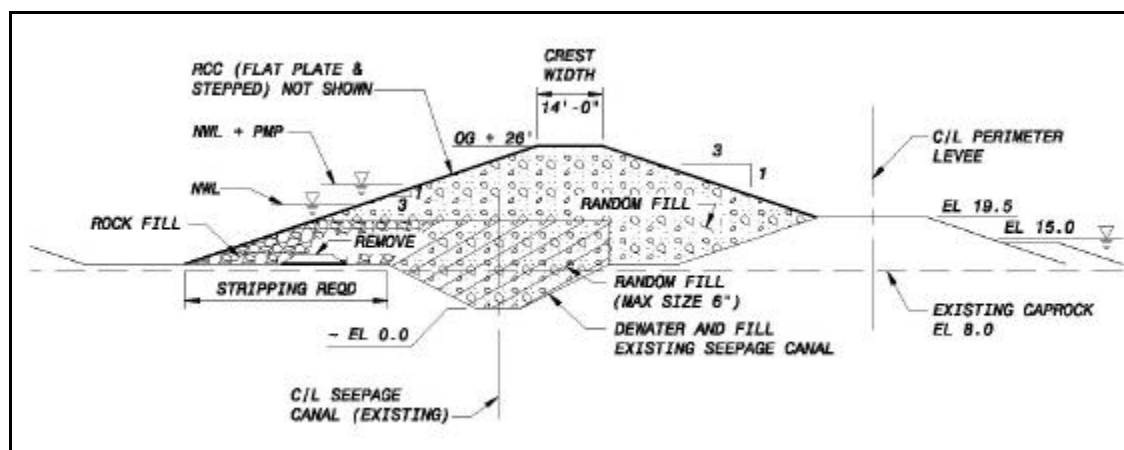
Zoned Embankment Cross-section along STA-3/4 Supply Canal
